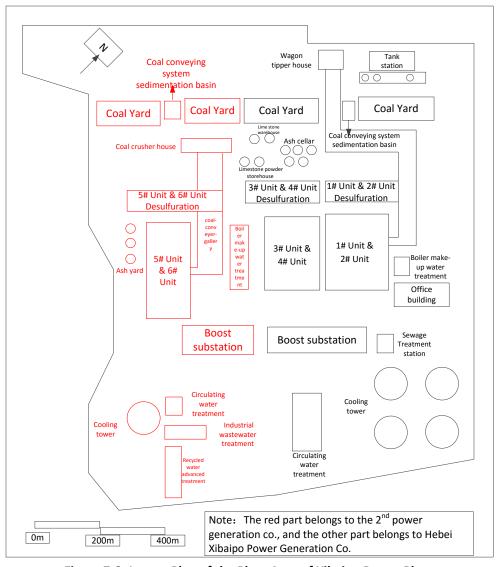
Layout Plan of the Plant Area of Xibaipo Power Plant
